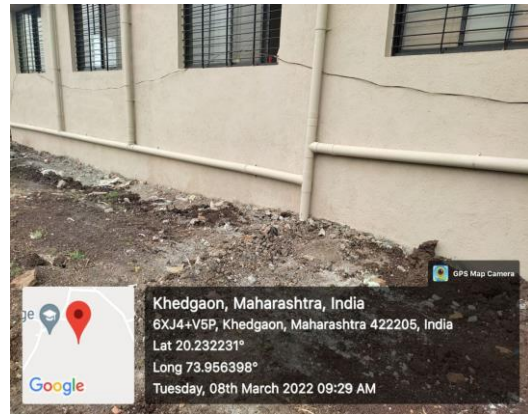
Picture showing rainwater harvesting pit and pipe coming through rooftop
